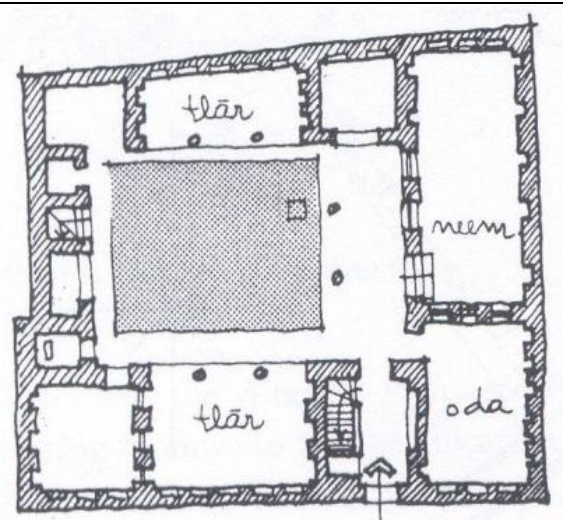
Ground Floor Plan of a typical Baghdad House (Source: 6000 years of Housing by Norbert Schoenauer)
